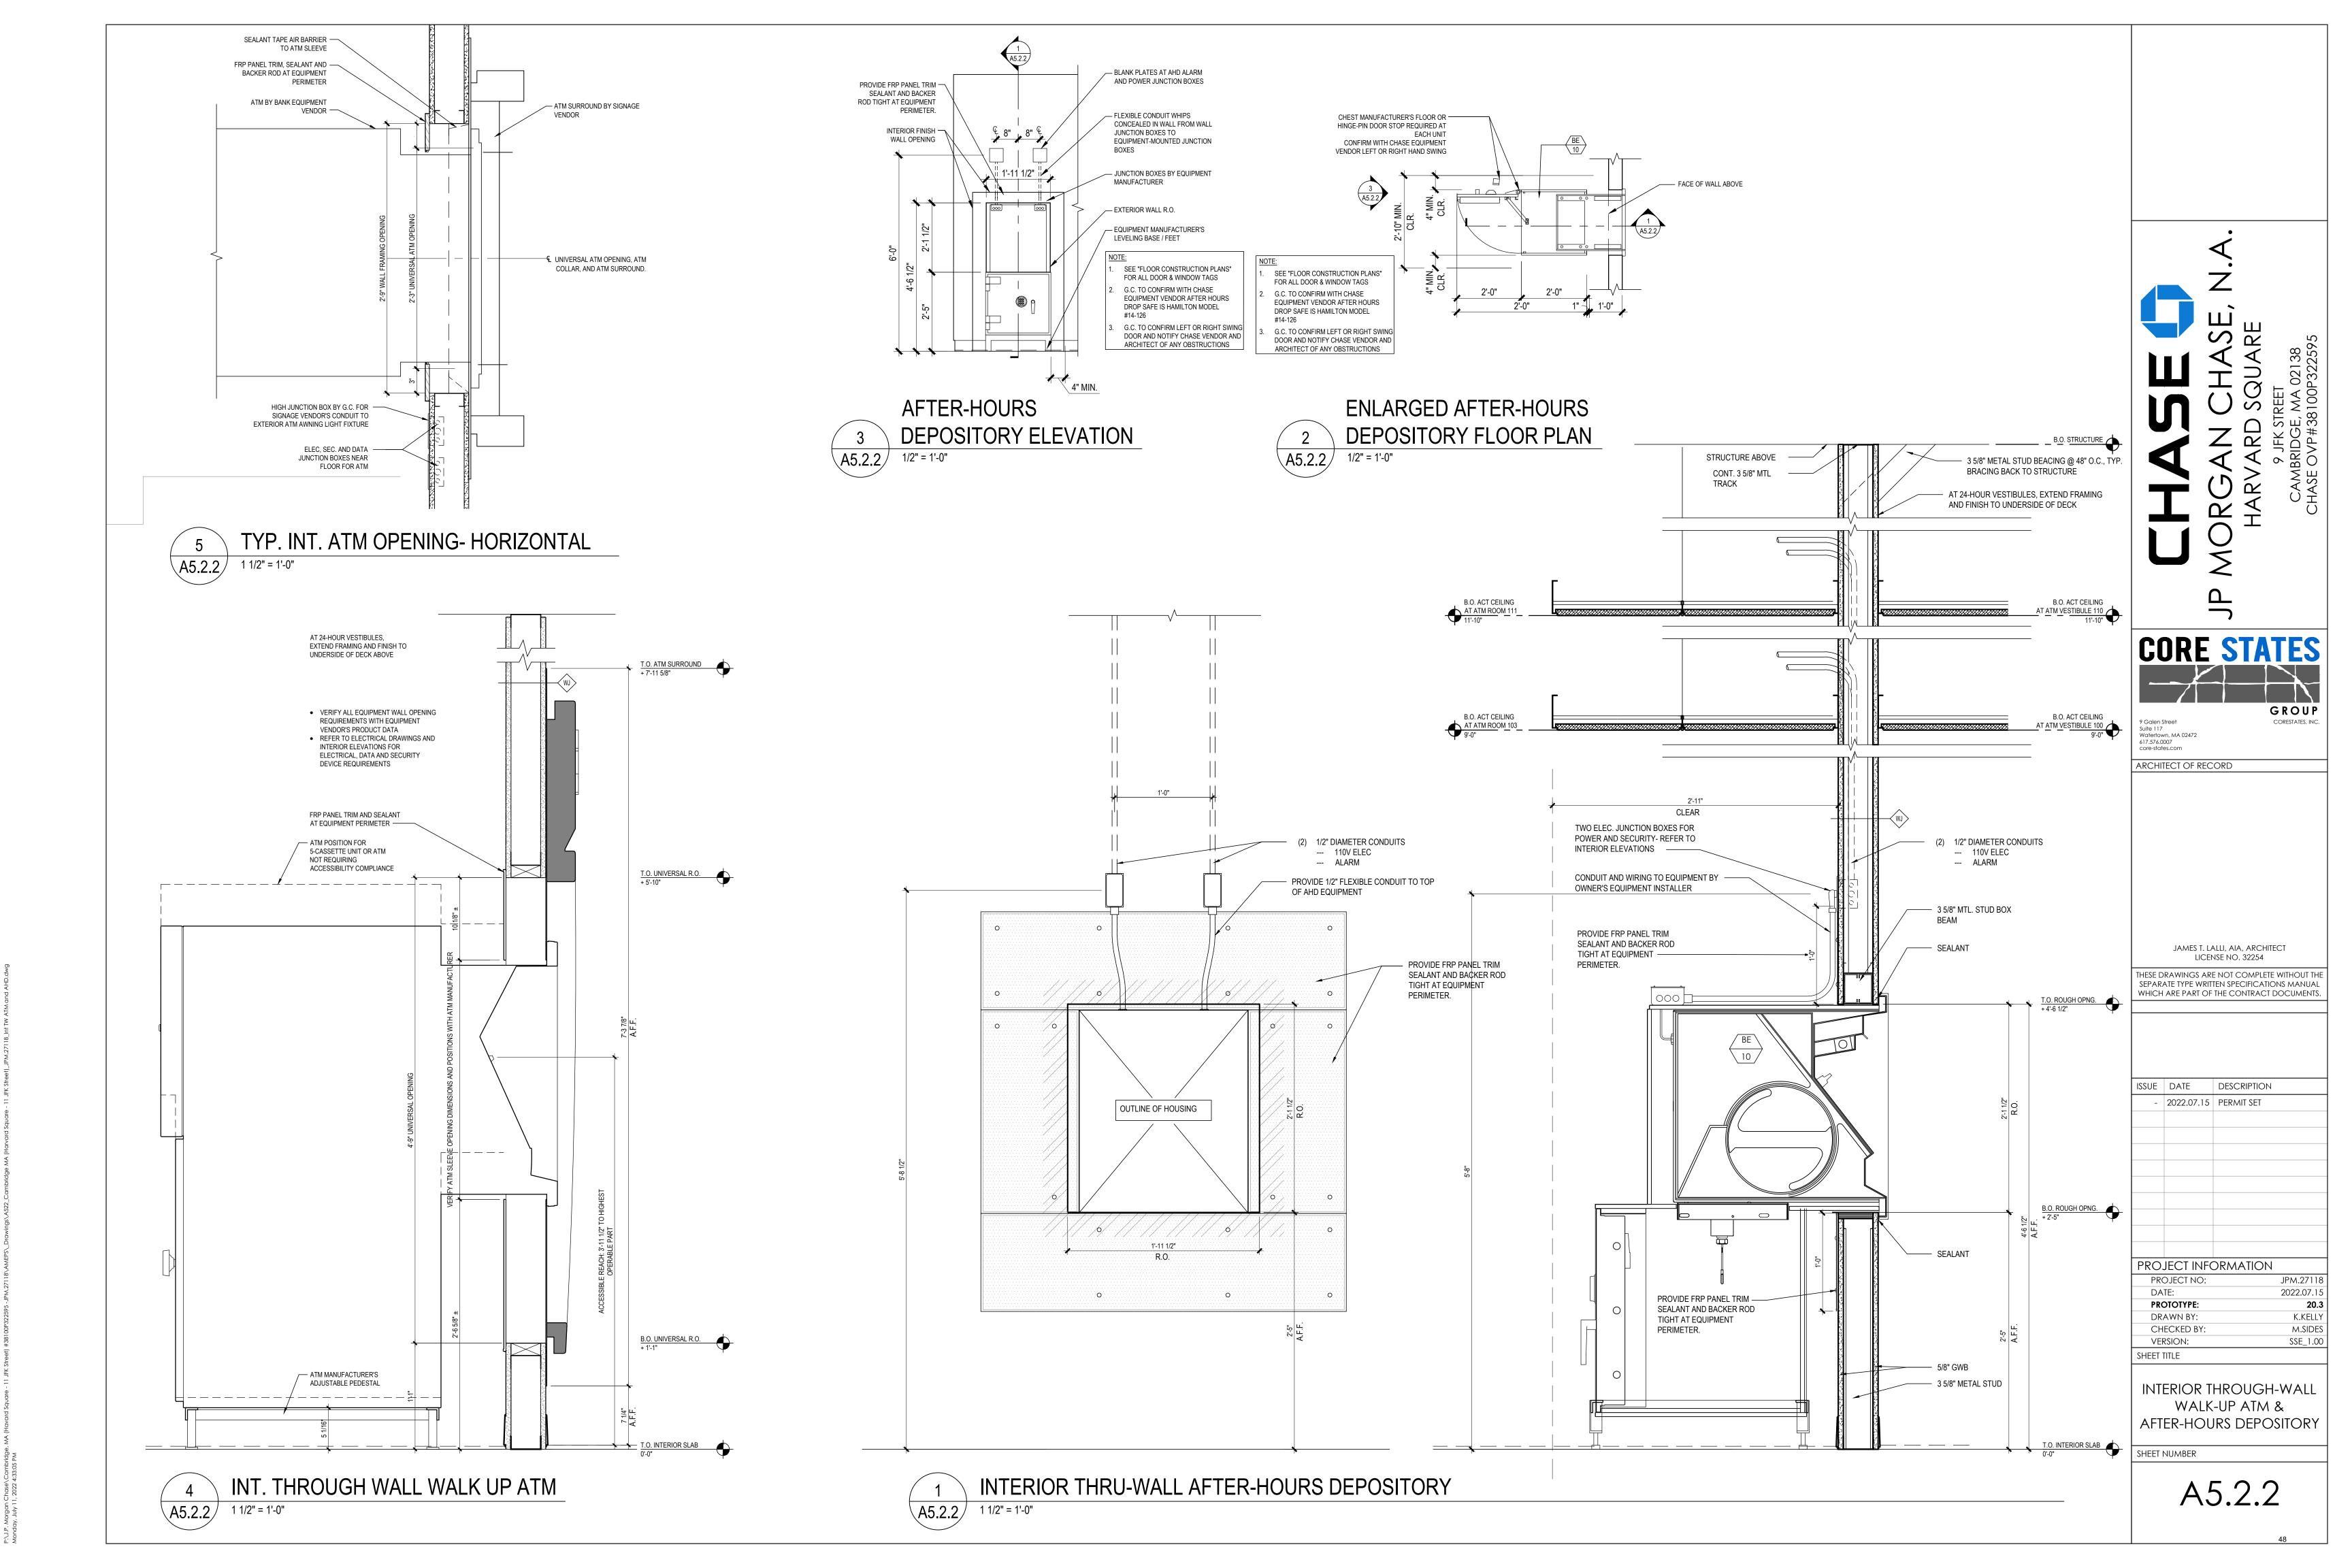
DETAILS: WALL OPENINGS & INTERIOR DETAILS
